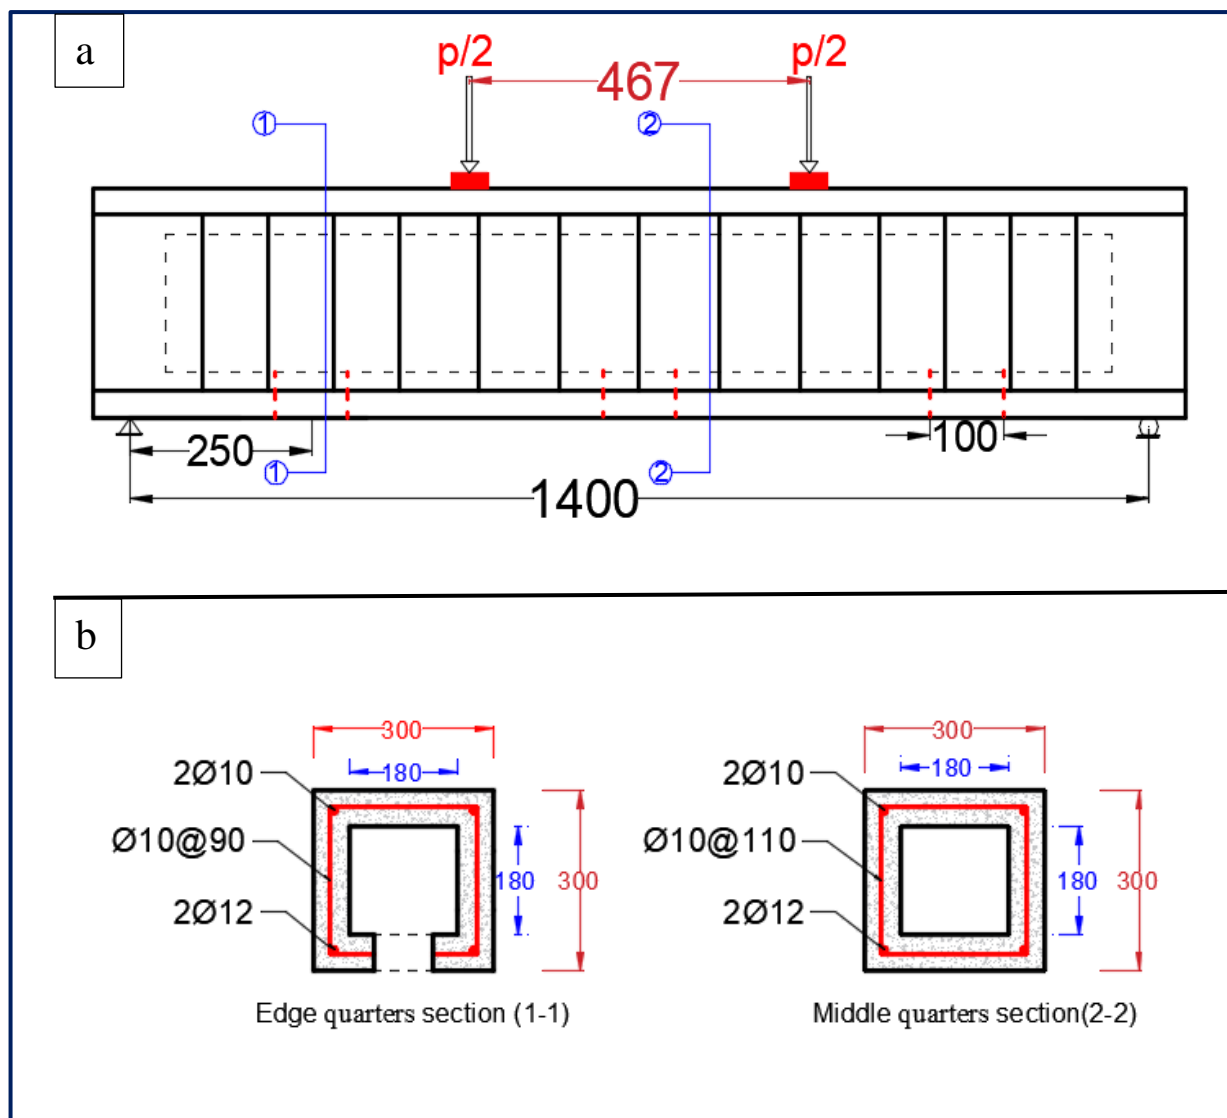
3: Reinforcement details for the beam H10SMB (All dimensions in mm)
